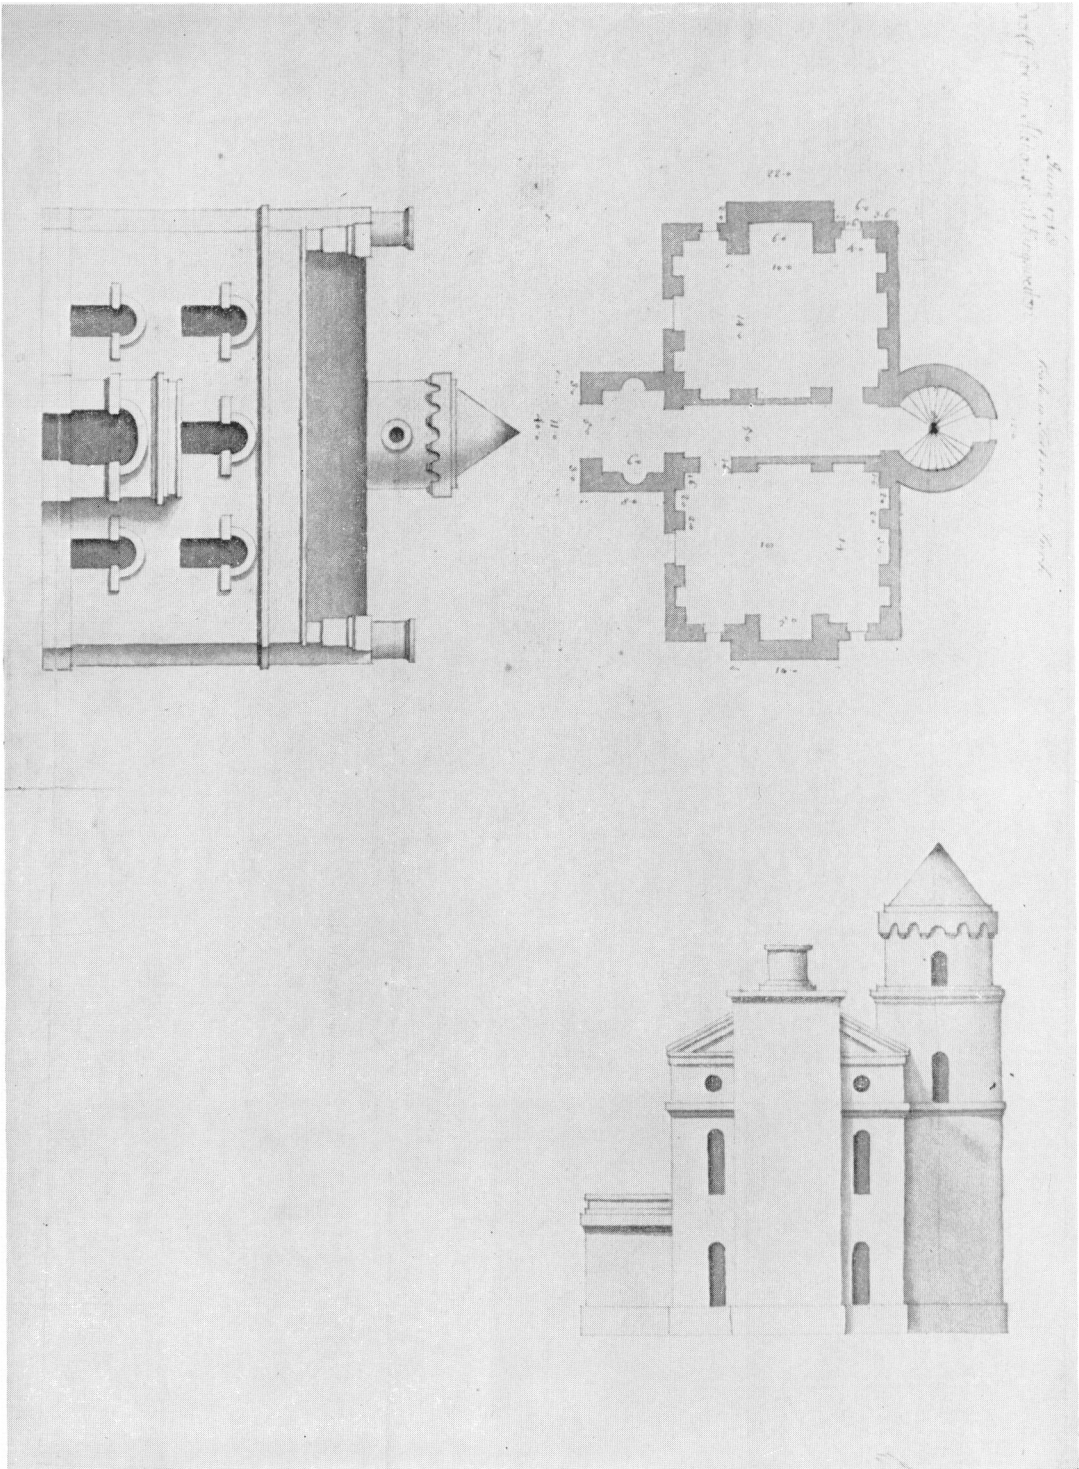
Plan and elevations for an alehouse at Kings Weston, 1718* [32]
